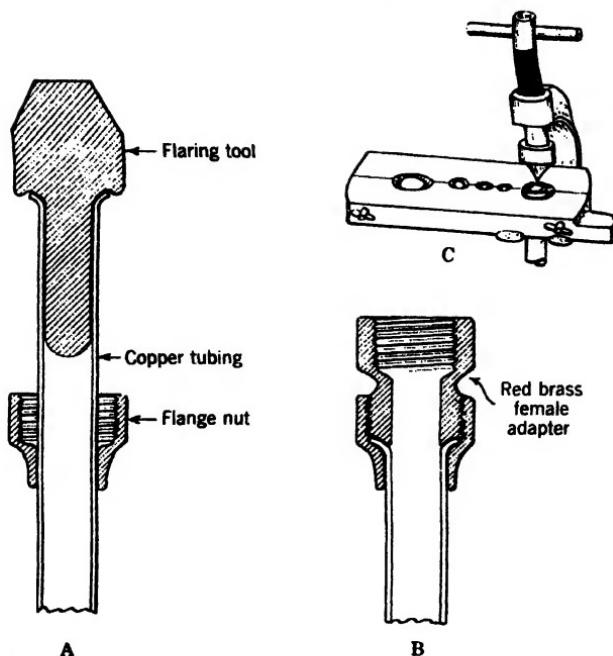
Flaring tool driven into end of tubing as shown at A turns a flange on the end of the tubing. This flange serves as an anchor to hold the pipe to the fitting and as a gasket to prevent leaking. B, the flanged tubing in place in a fitting. C, a flanging tool for five sizes of tubing.
